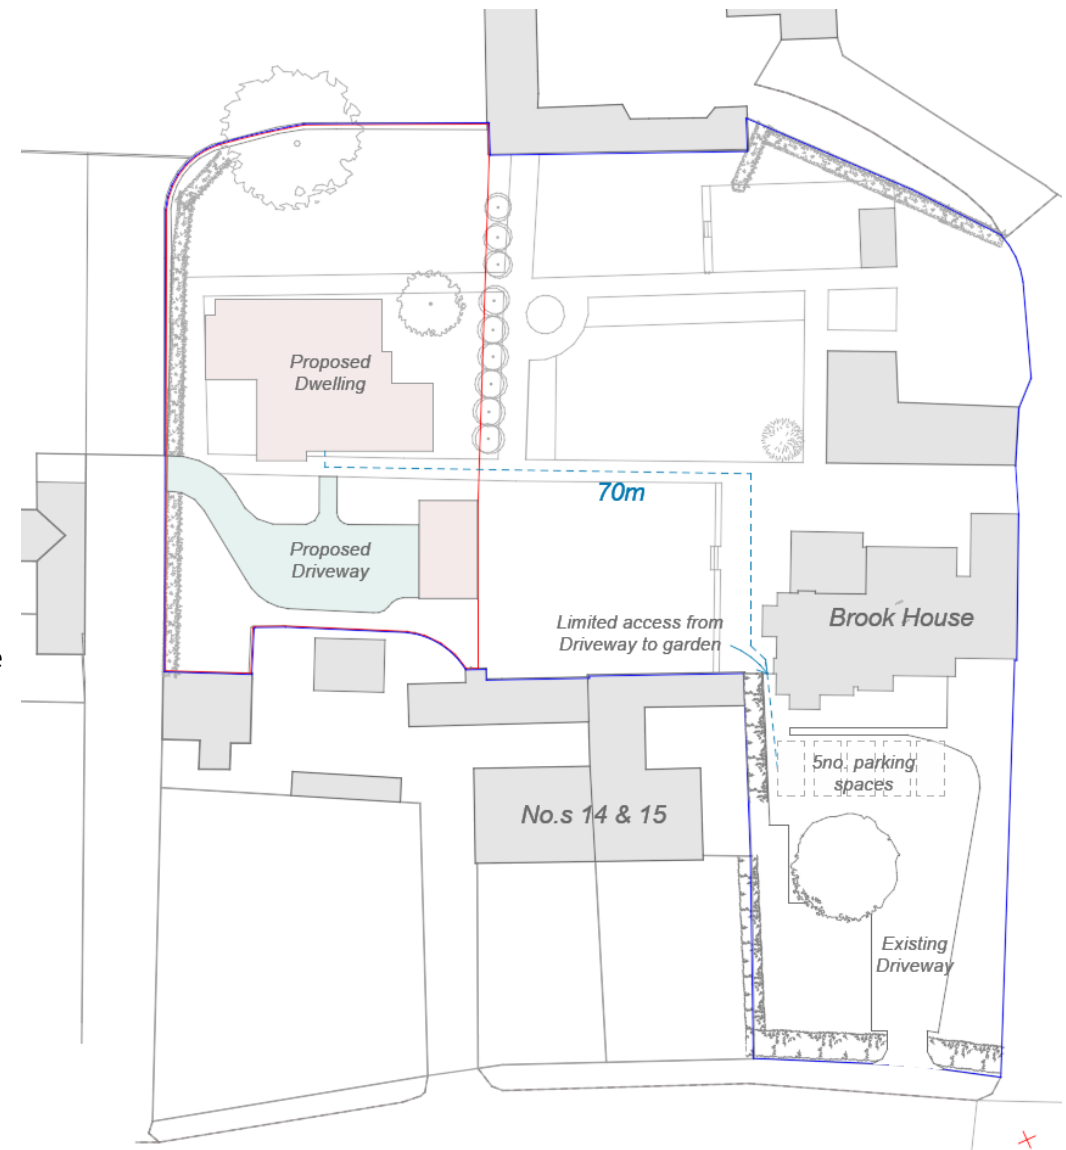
Proposed new access relative to use of existing driveway to Brook House
